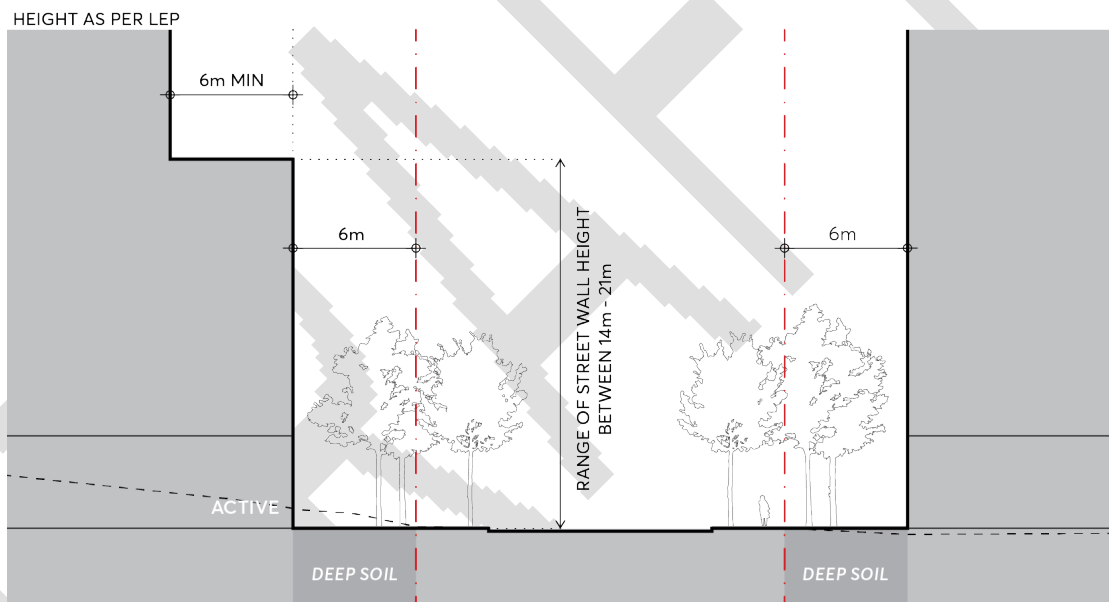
Campbell Street (Section A) Setbacks and Street Wall Height
